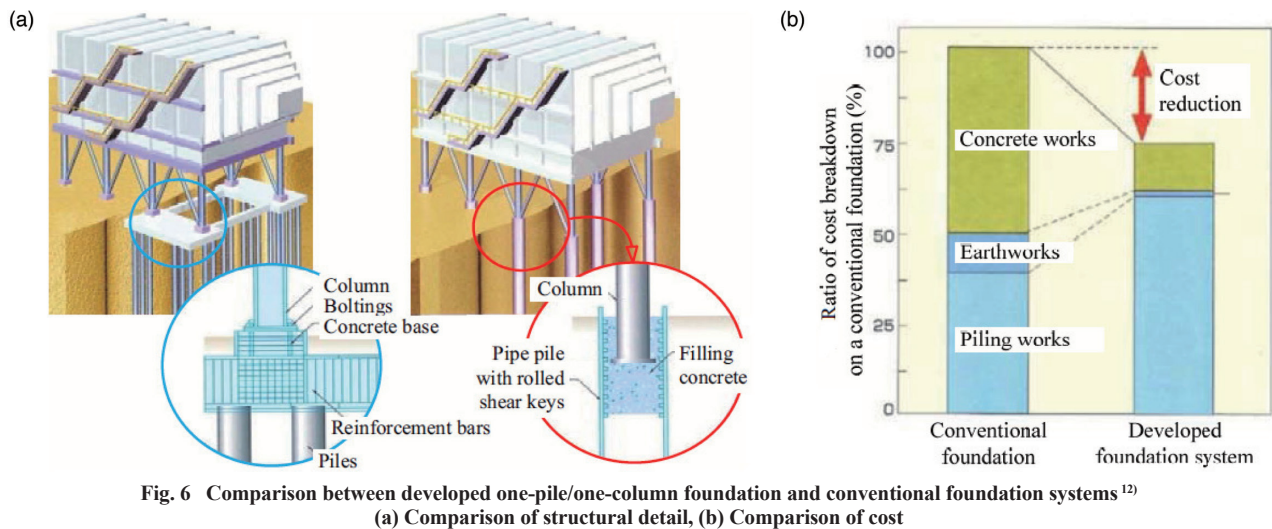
Comparison between developed one-pile/one-column foundation and conventional foundation systems¹²⁾
